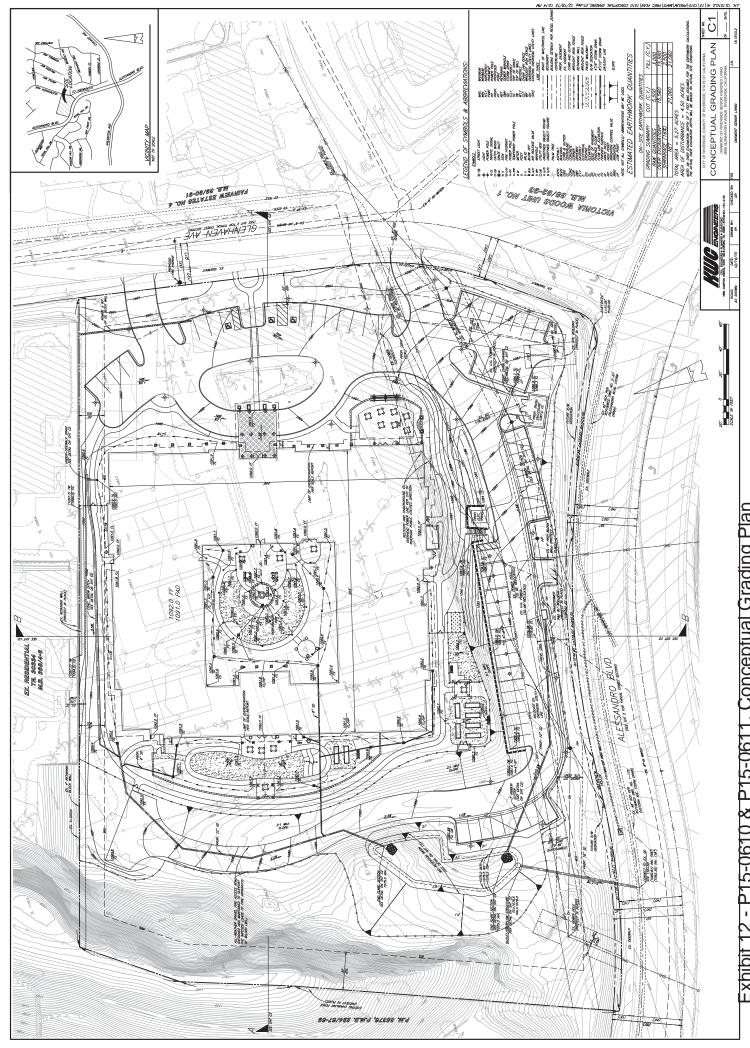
P15-0610 & P15-0611, Conceptual Grading Plan
